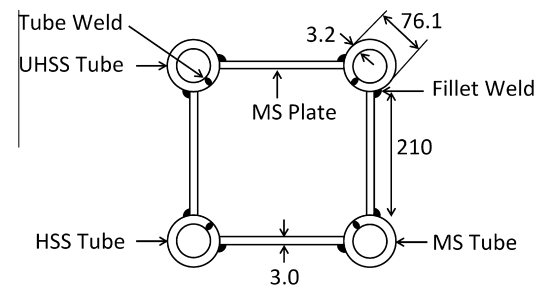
Configuration of the 500 mm hybrid fabricated section (nominal dimensions in mm).
